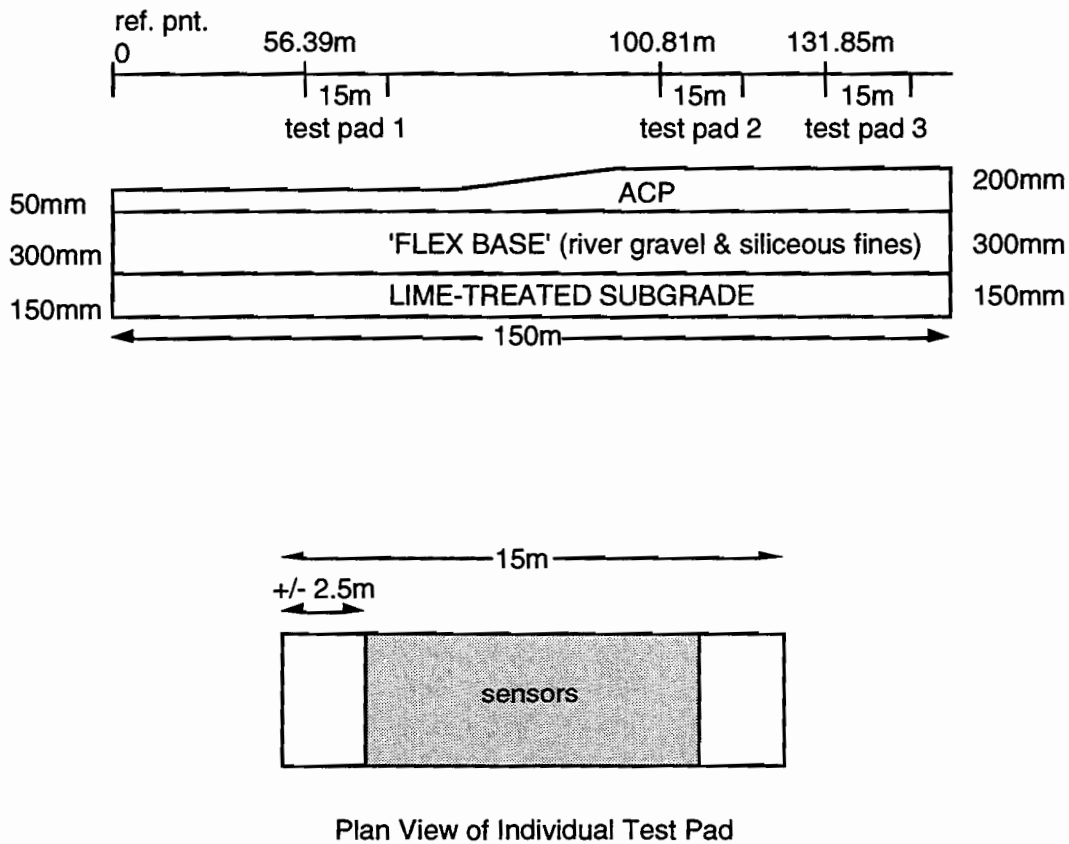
Pavement design of flexible test sections in Victoria and positions of instrumented pads
